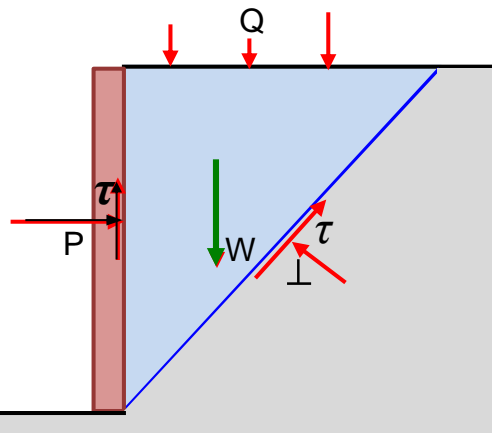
Earth Stress; a sliding soil wedge retained by a wall
